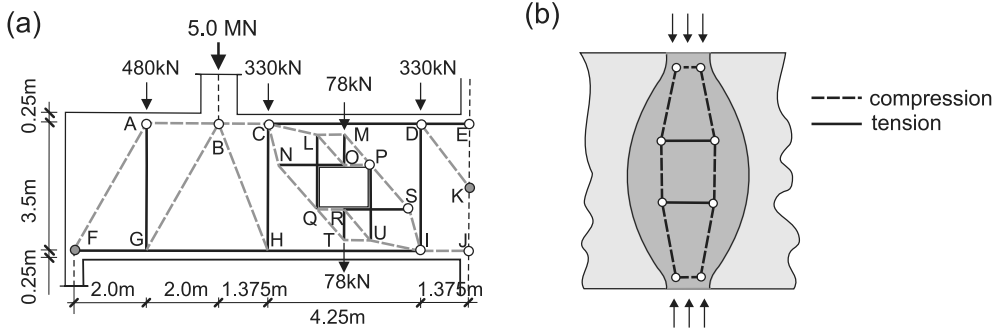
(a) Example truss system. (b) Compression field as strut-and-tie model.
